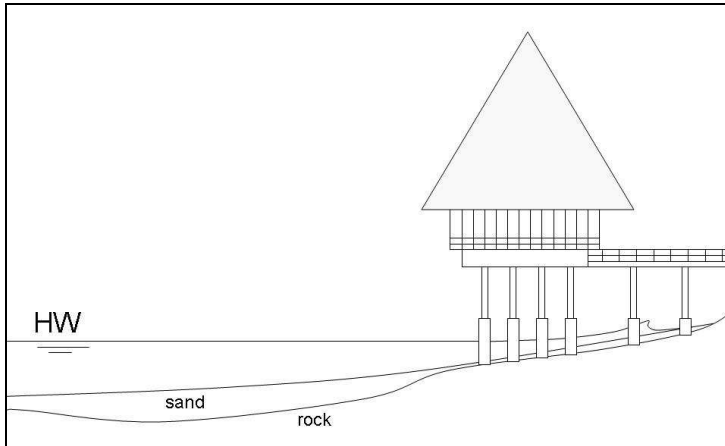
Rebuilding on poles after collapse (see Figure 7-3)
